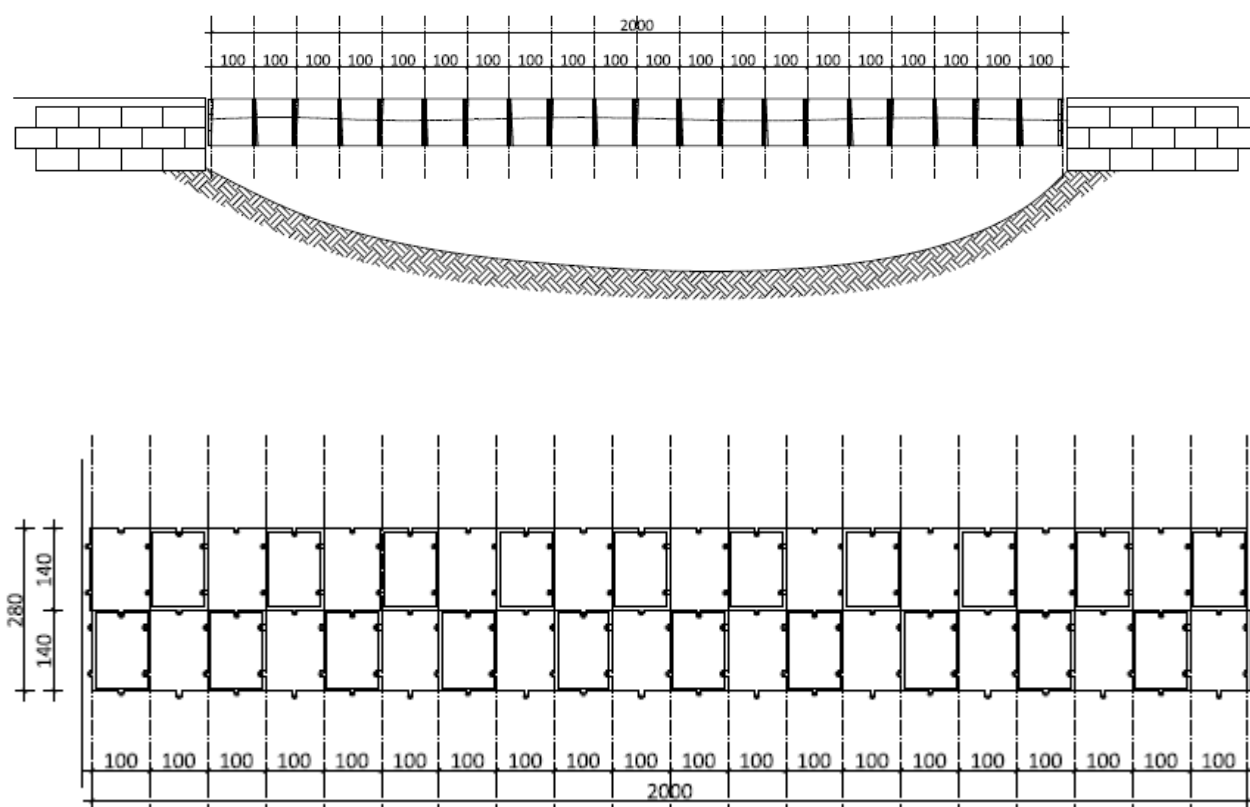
Bridge example, 20 m long x 2.8 m width, side and plan view.
